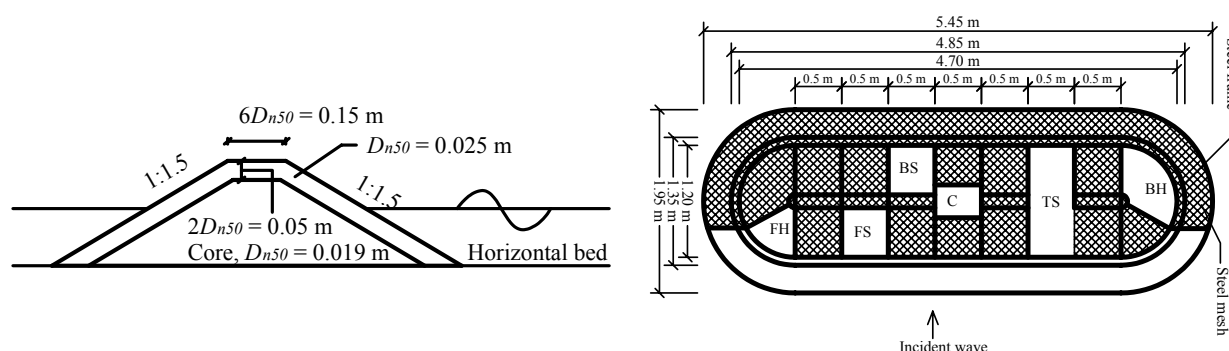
Plan view and cross section of model by Vidal *et al.* (1992).
